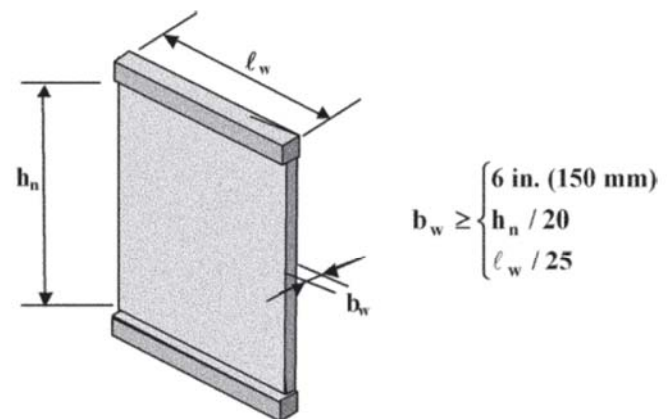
Minimum cross-sectional dimensions for rectangular reinforced concrete walls.
